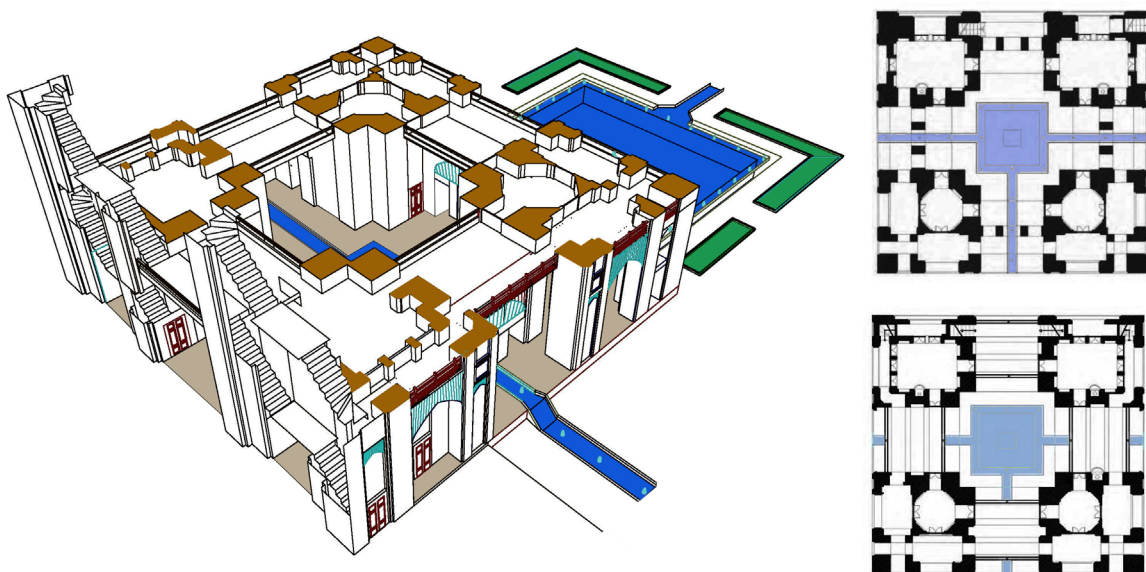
3D model and plans (basement is the Top plan and the plan of the first floor is shown in Bottom) of the central palace in Fin garden (Archive of Kashan CHHTO) (modified).
